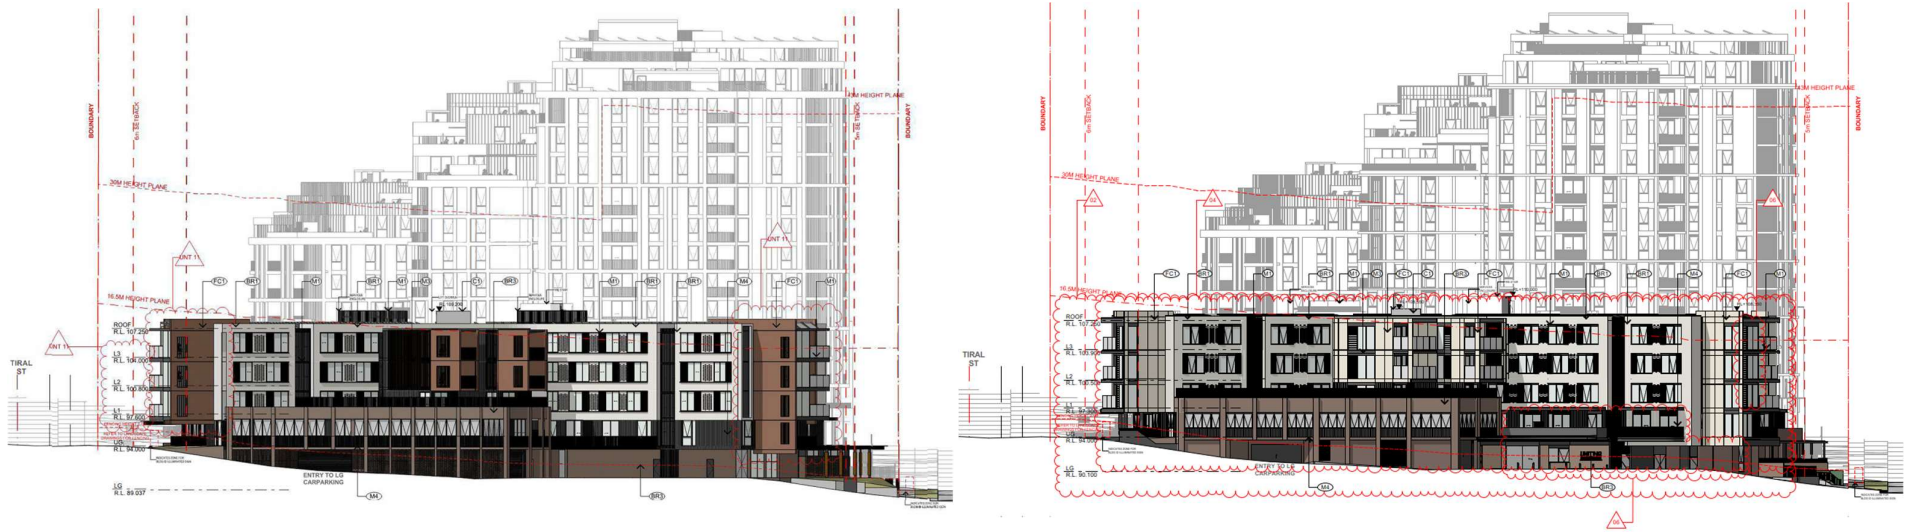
Approved and Proposed East Elevation of Building A (1 of 2)
